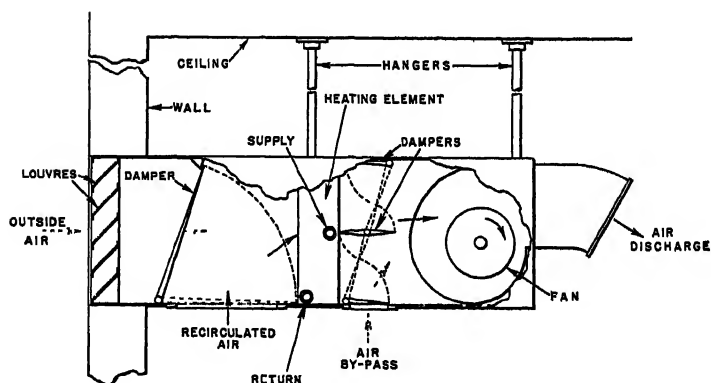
SUSPENDED TYPE UNIT HEATER, HOUSED TYPE FAN
